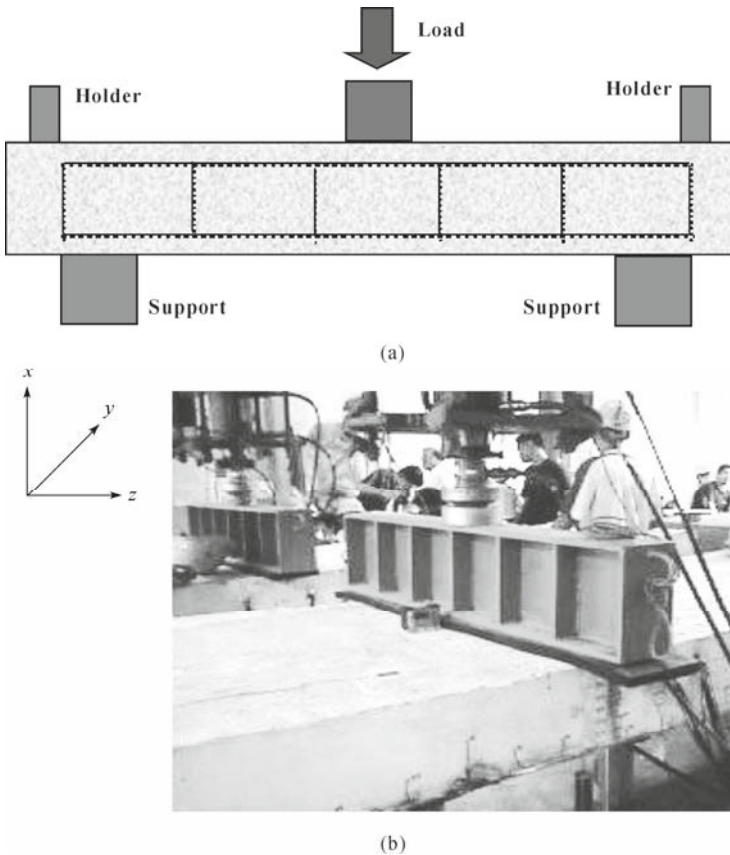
Setup of the load test on RC beam. (a) Schematic drawing; (b) Application of loading on the beam (Hao, 2001)
